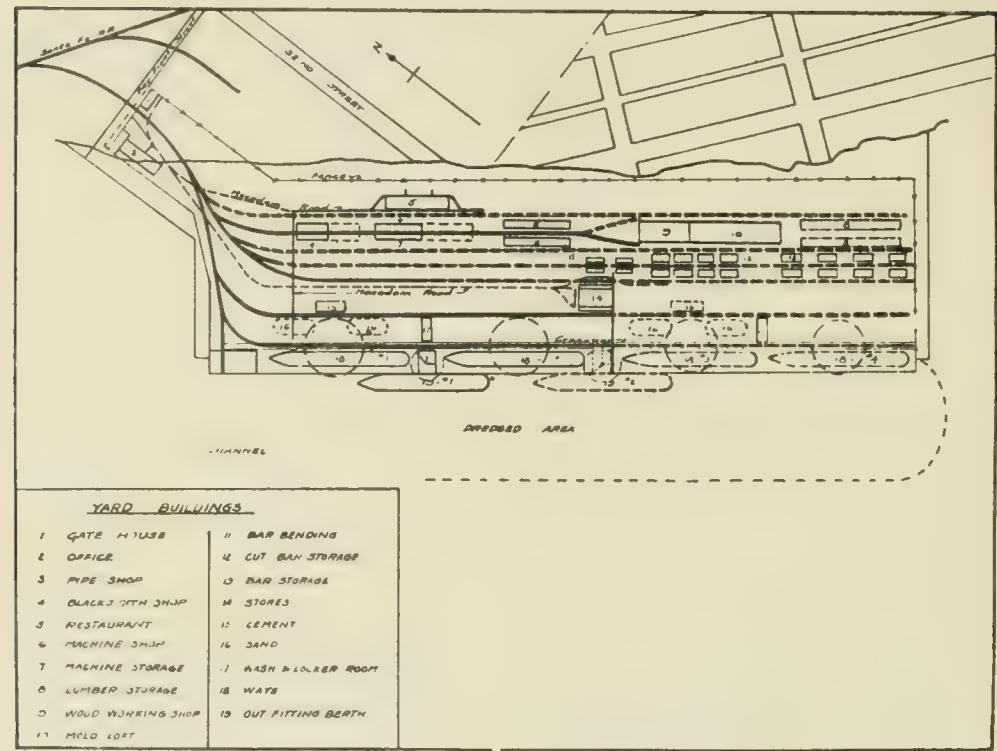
LAYOUT AND VIEWS OF CONCRETE SHIPYARD AT MOBILE, ALA.
